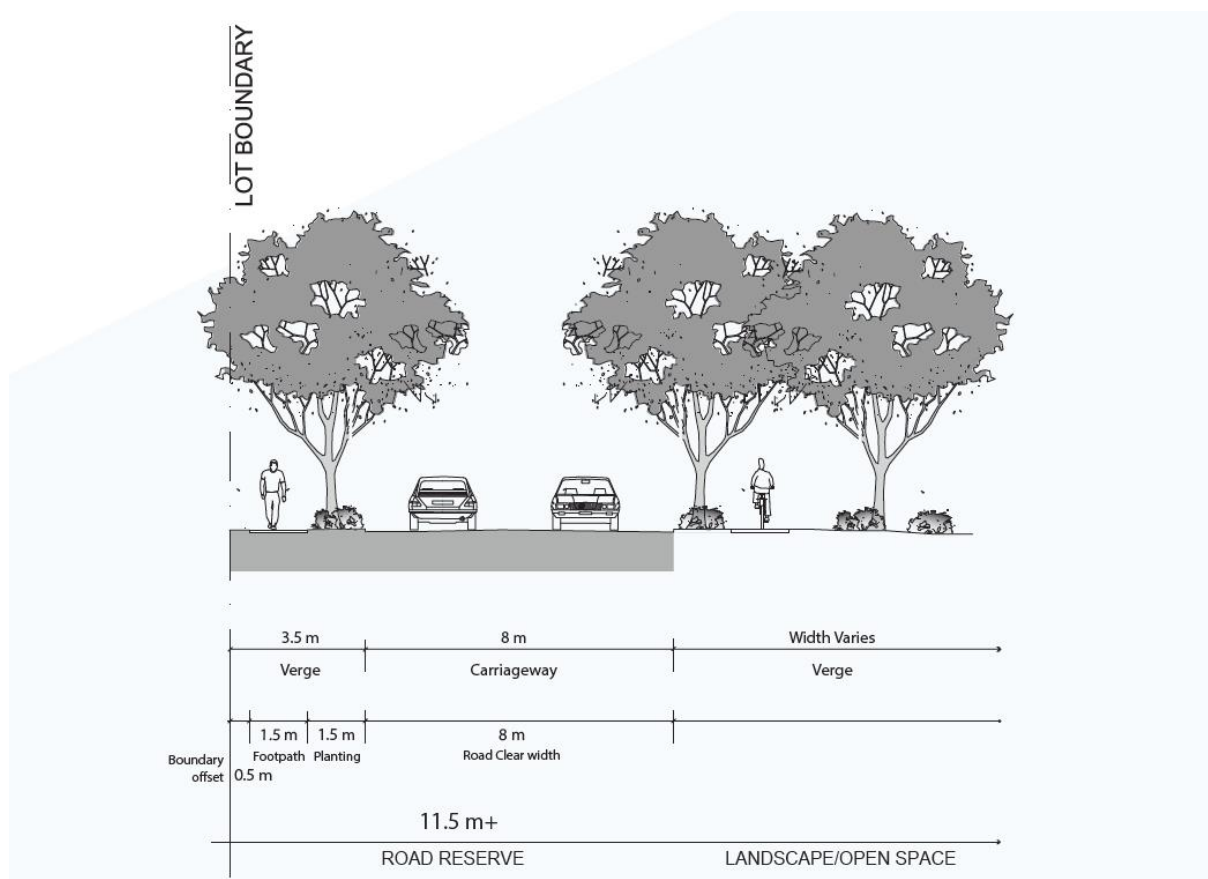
APZ Perimeter Road without Parking (Source: Design + Planning)
